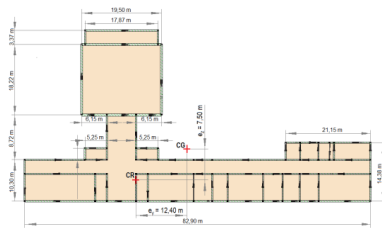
General plan of Horticulture Faculty (wings B1 and B2 with no expansion joint)
